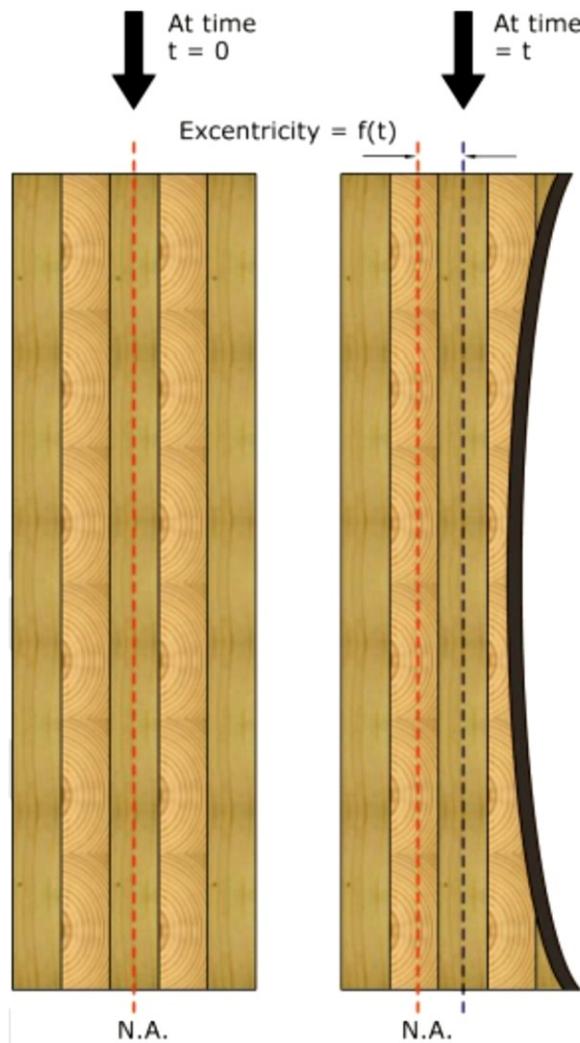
Eccentricity in a heavy timber wall due to fire [4]
